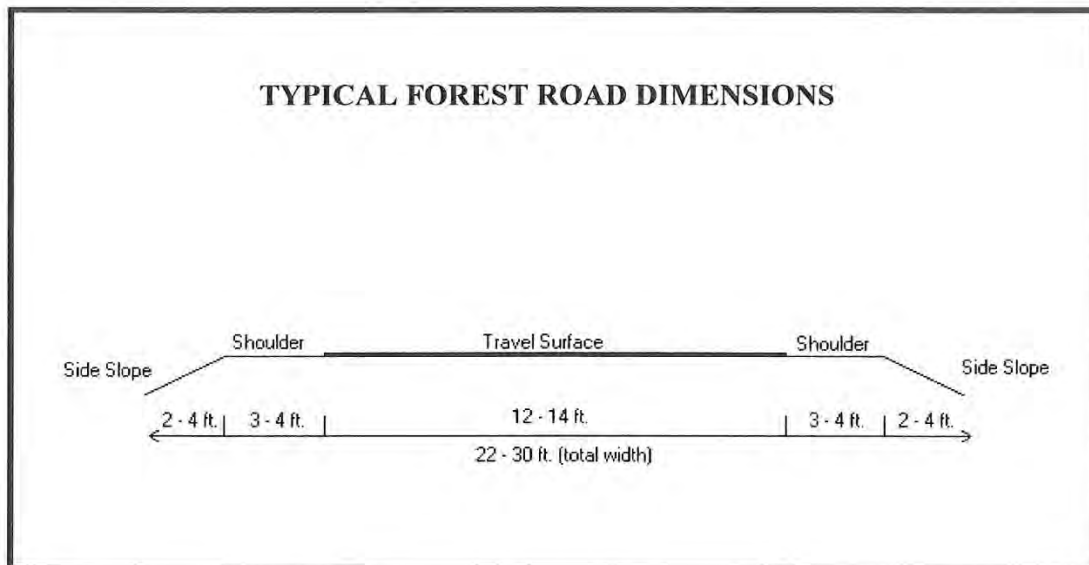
Dimensions of a typical forest road constructed in wetlands. In general a top width of 18 – 22 ft., made up of a 12 – 14 ft. wide travel surface with 3 – 4 ft. shoulders on either side, should be sufficient. Road heights of 1 – 2 ft. with 2:1 side slopes will result in total widths of 22 – 30 ft.
